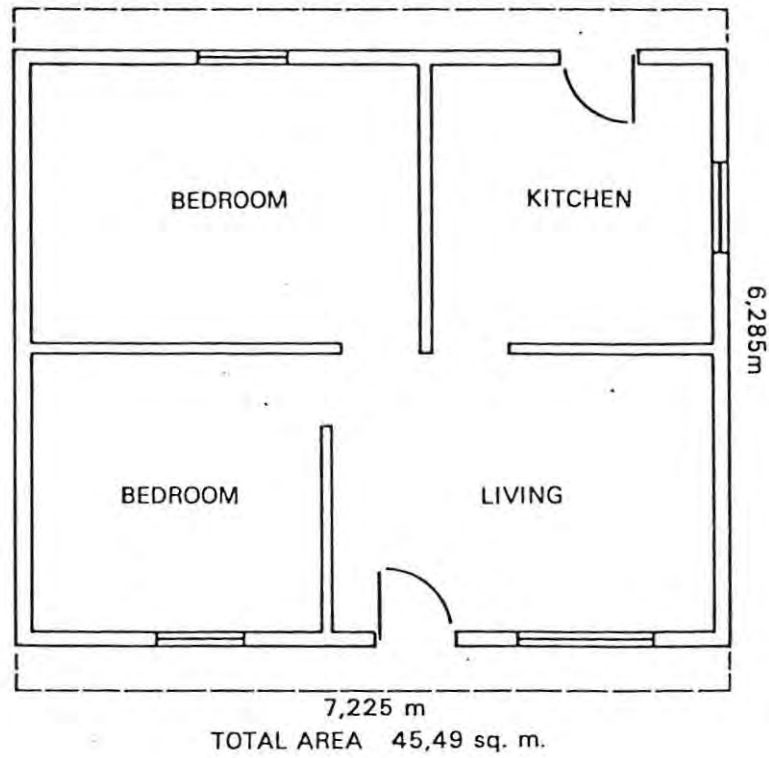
(a): Floor Plan: Original Housing Type 51/6
